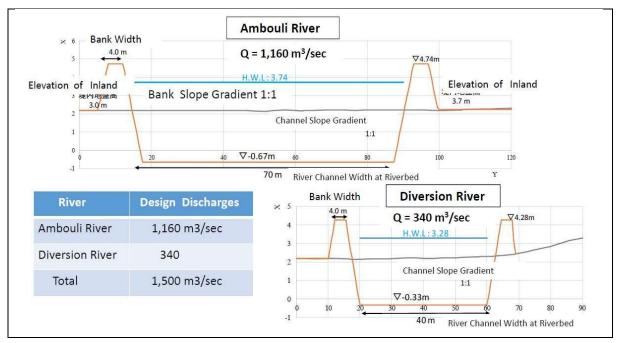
Typical Cross Section for Alternative 2 A (Q=1,160 + 360 m3/sec)
